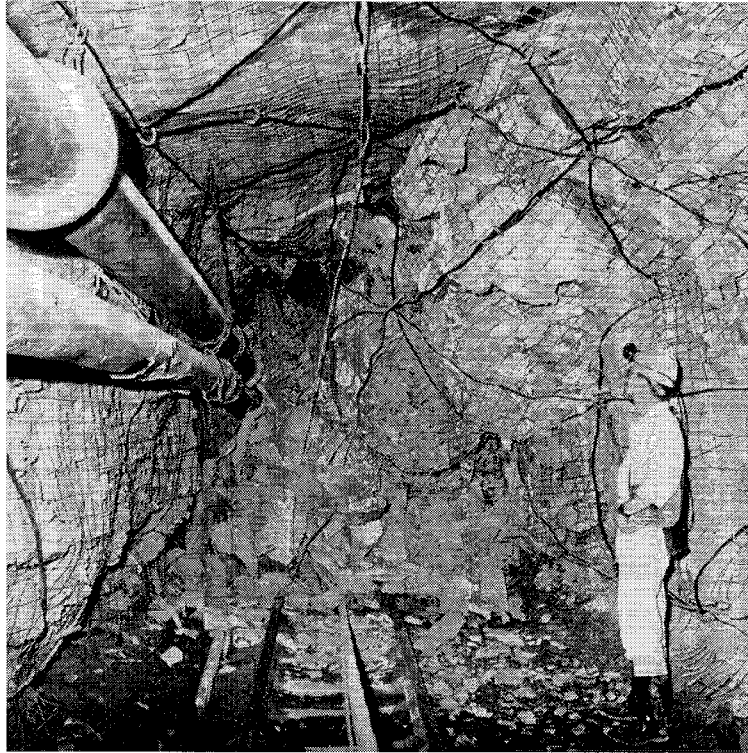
Damage to 34K footwall drive at Site B showing complete closure of the tunnel.
